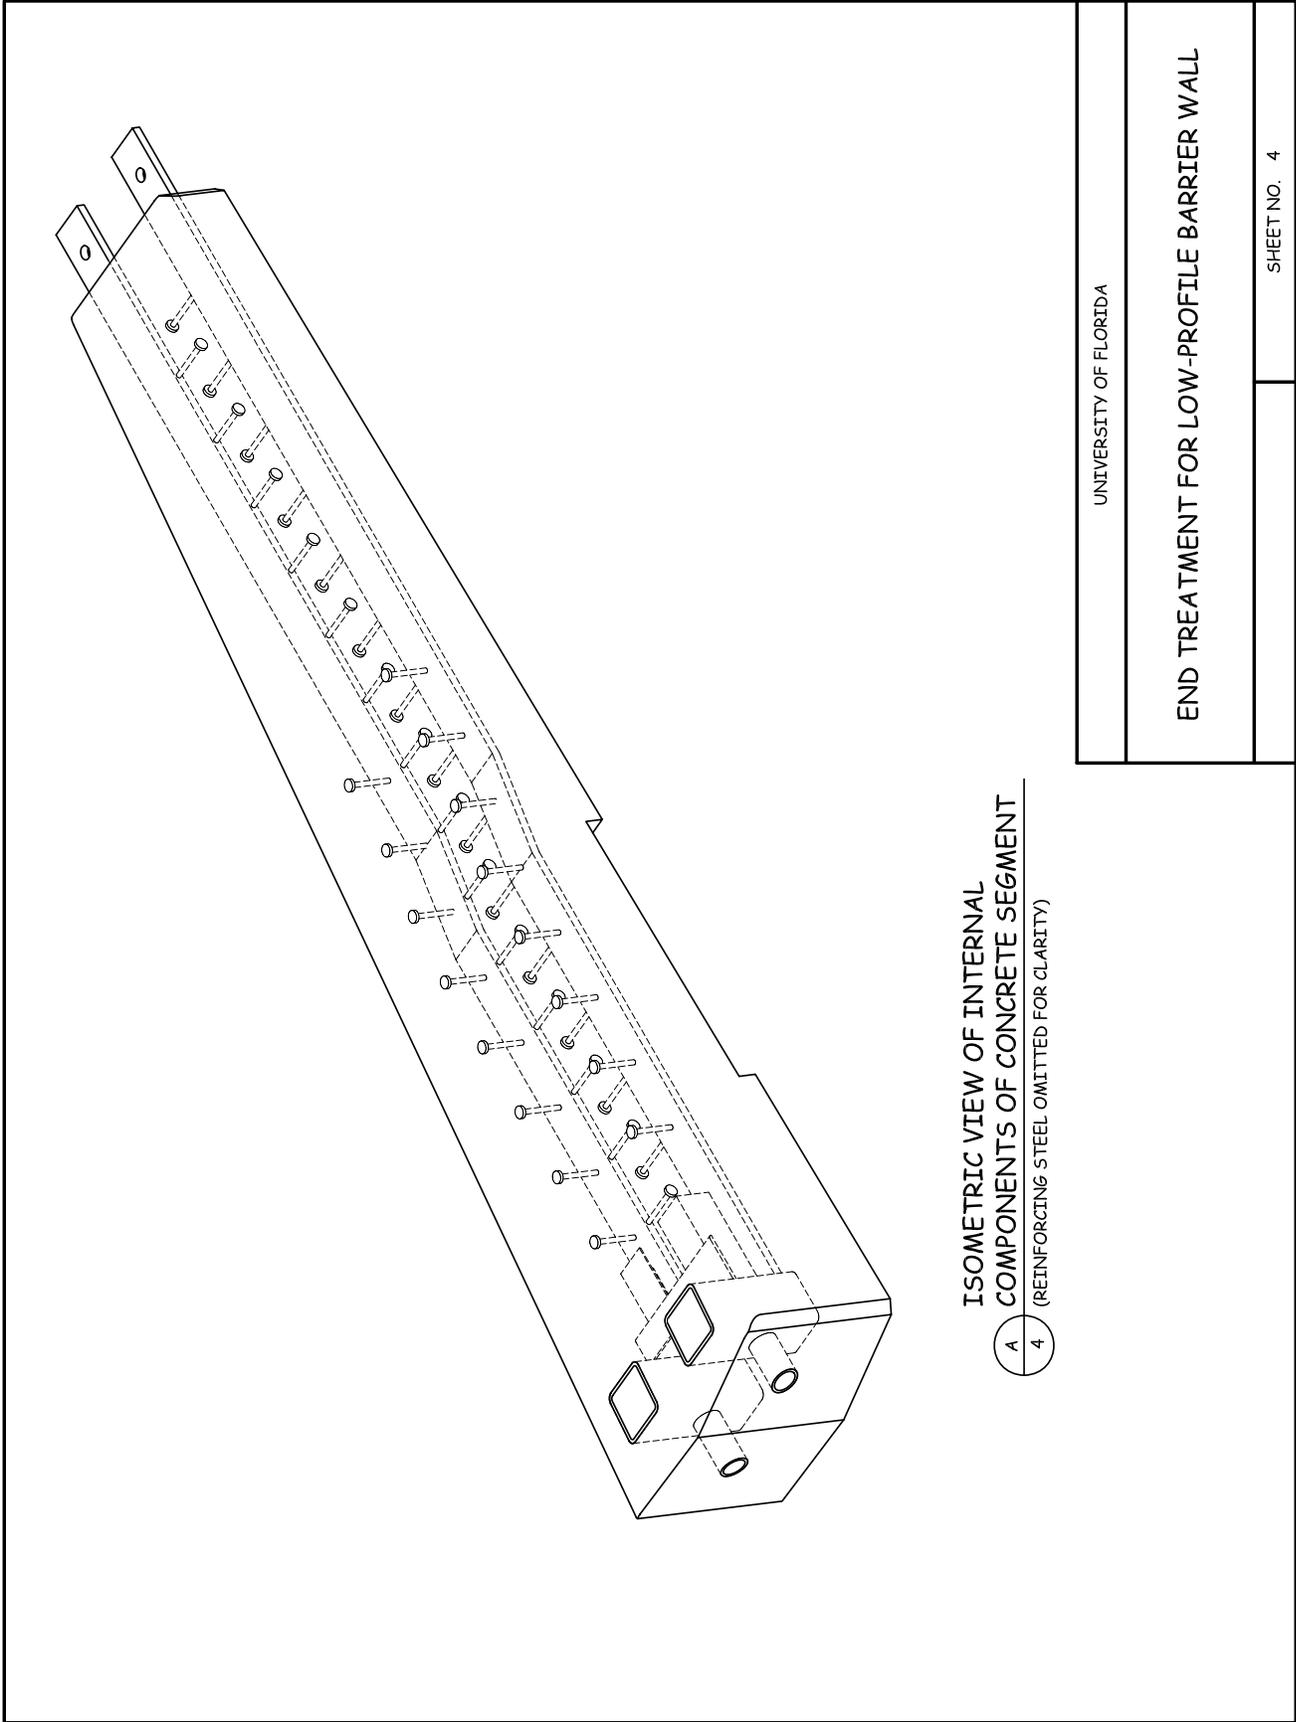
Drawings of Florida Concrete Curb End Treatment (4 of 14)
